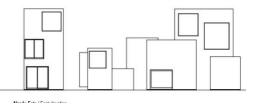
Shibaura house, SANAA (2011) • Source: El Croquis
